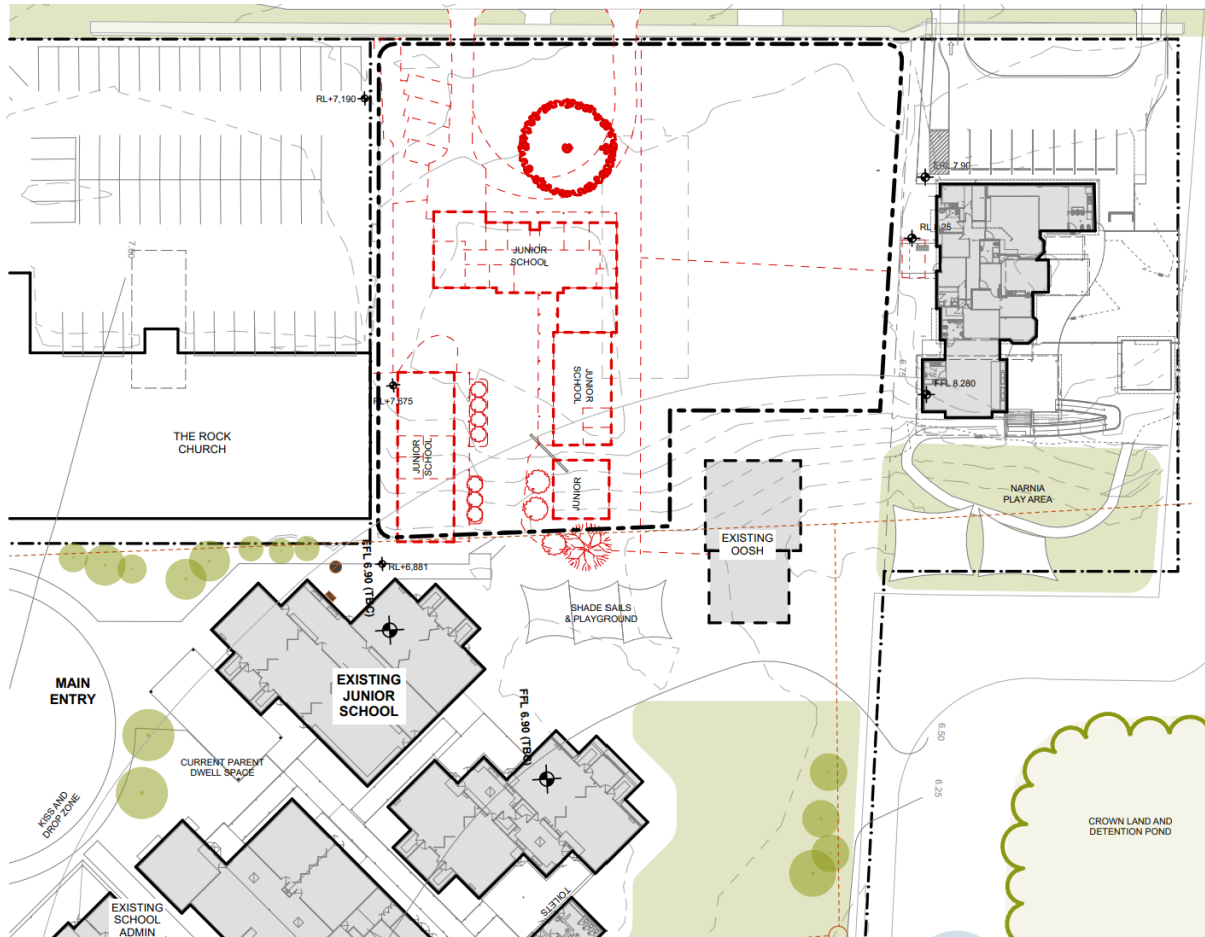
Existing/Demolition Plan DA1007 (SHAC 2021)
